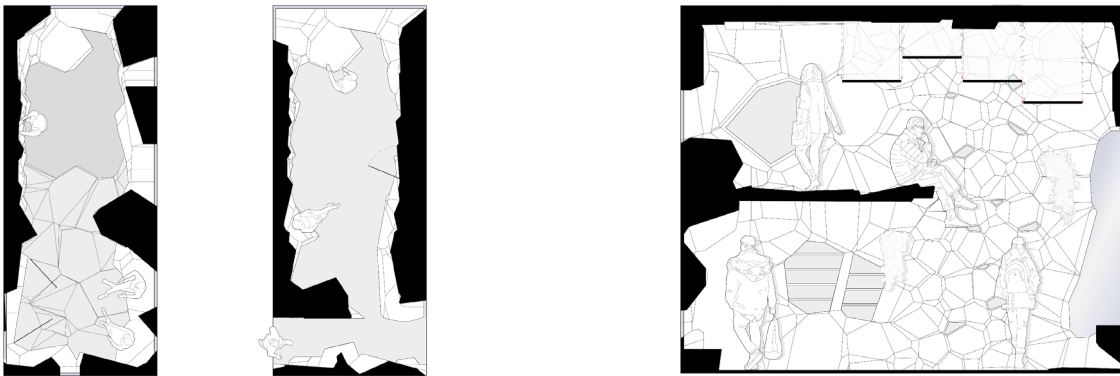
& 18: *Upper and Lower Floorplans and Longitudinal Section
